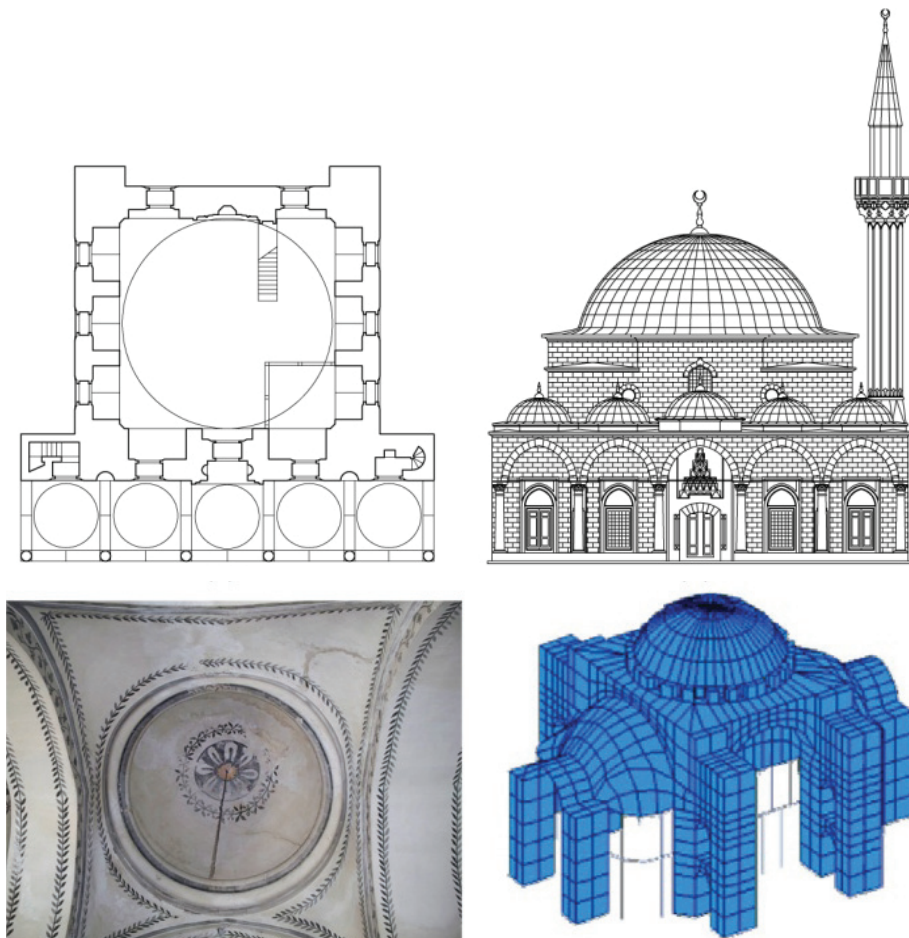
(a, b) Plan drawing and façade drawing of the historic building; (c) Crack pattern of the dome of the historic building; (d) FEM model
